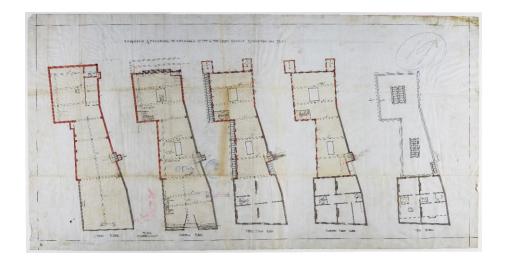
Floor Plan 149-150 High Street (Tees Archive)
